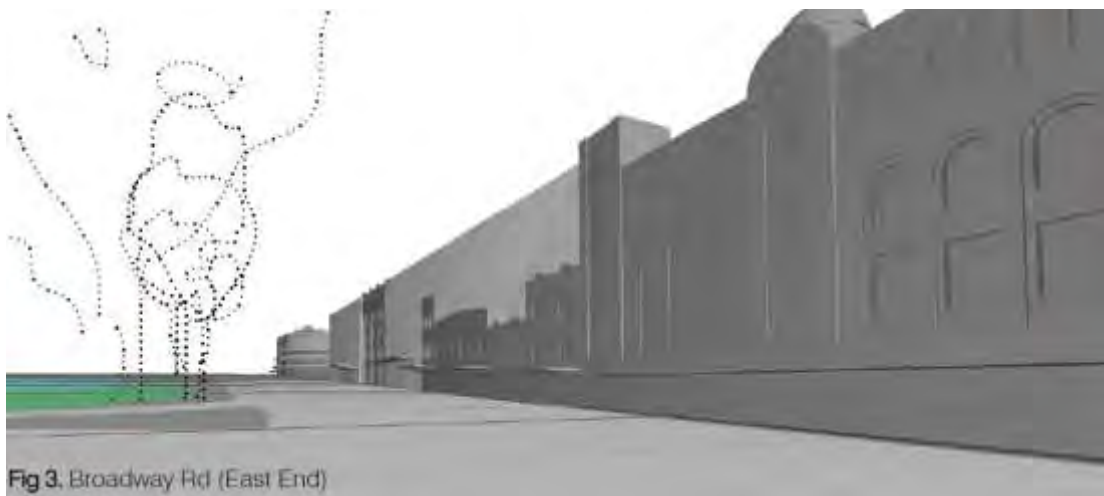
Proposed building envelope looking east from the corner of Broadway and Glebe Point Road
